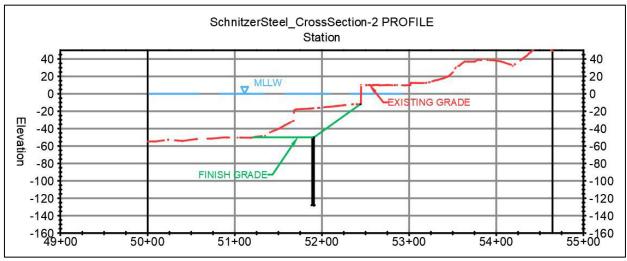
Schnitzer Steel Proposed Design Typical Cross Section
